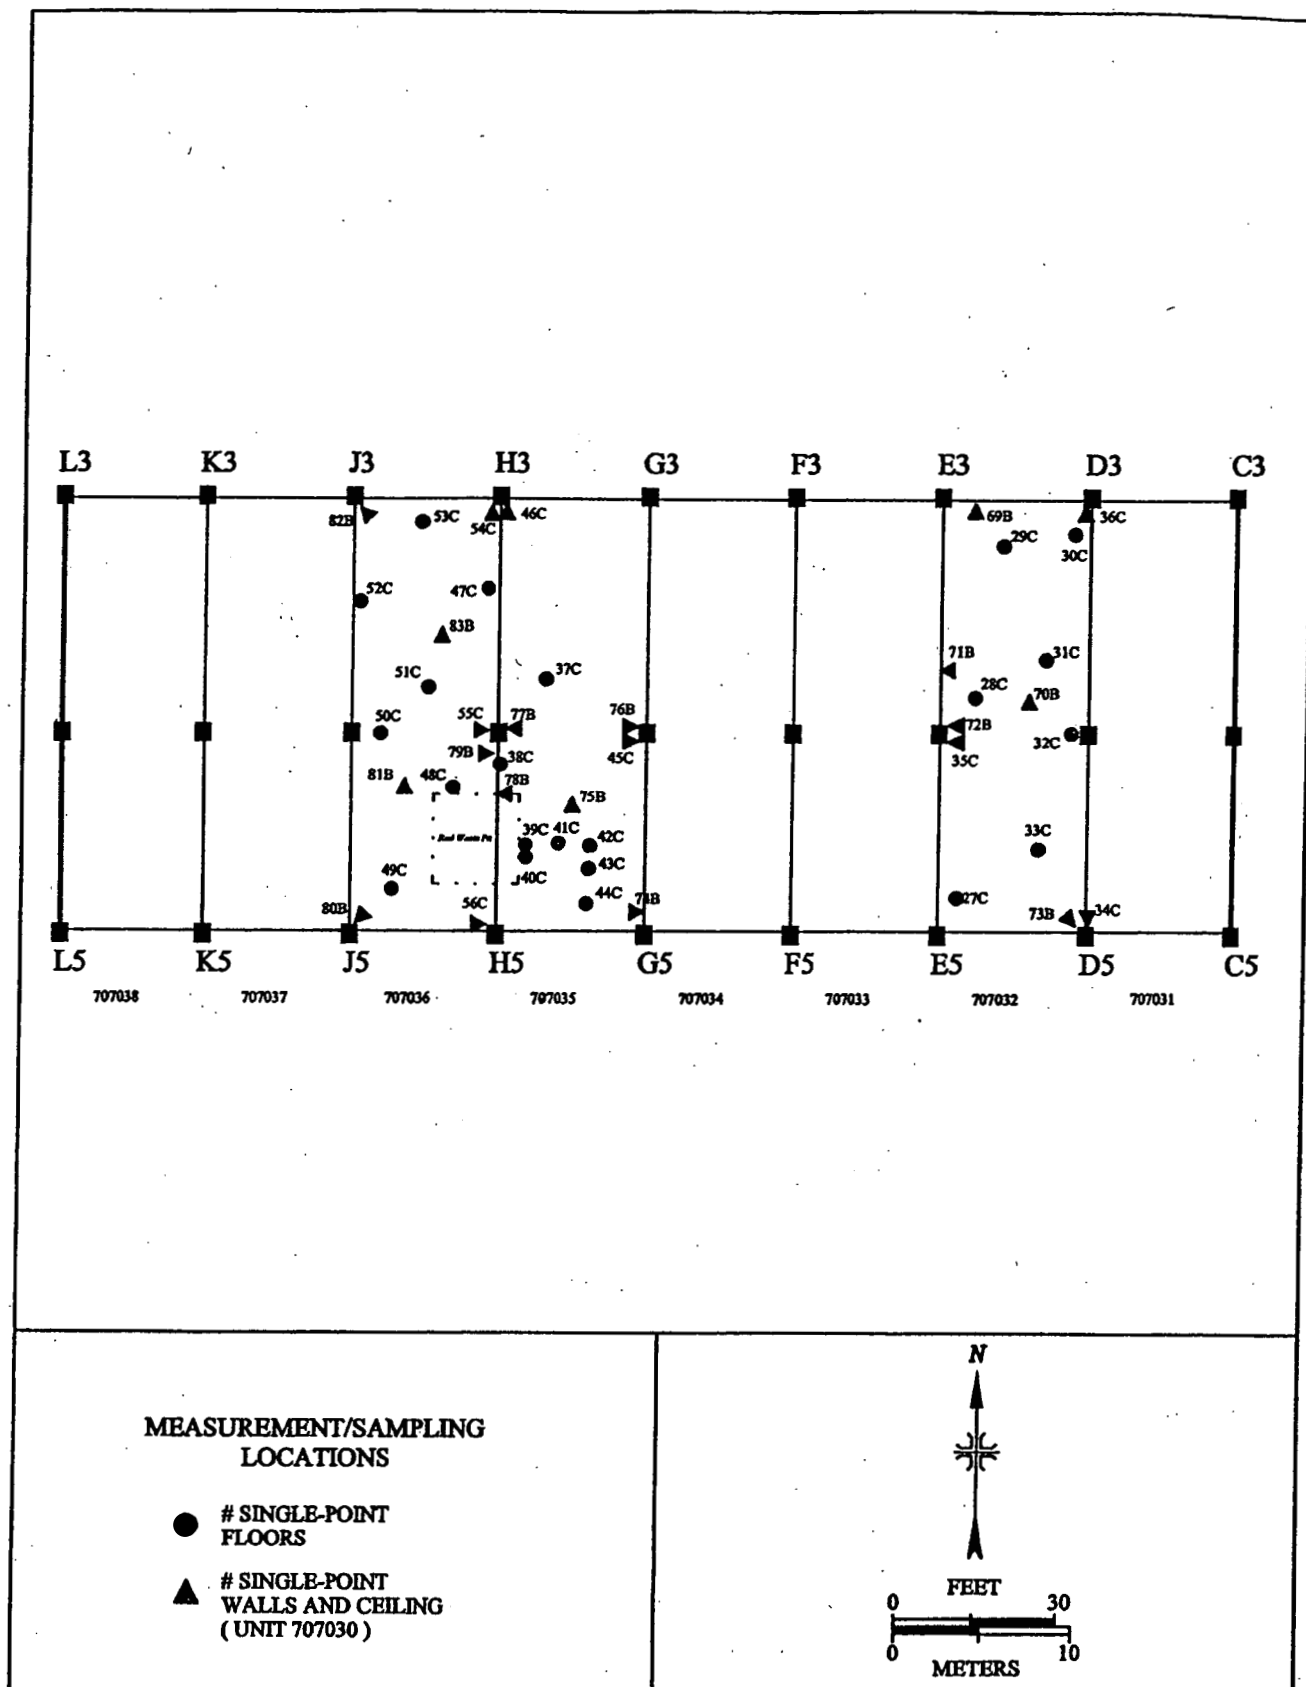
Building 707, First Floor, Survey Units 707030-707038 (B Module) - Measurement and Sampling Locations
